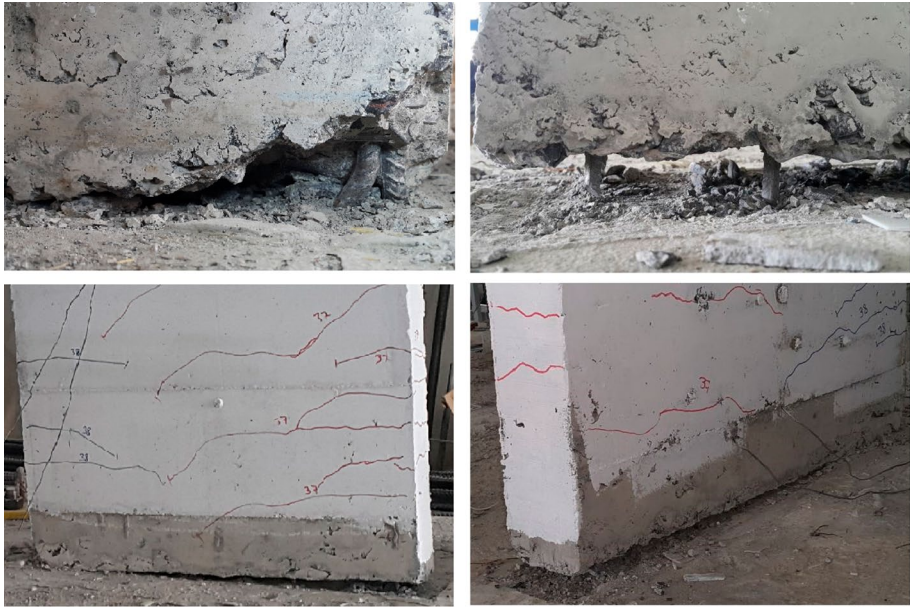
Buckling of the reinforcement of the shear walls and separation at the base of the shear wall in strengthening of the damaged frame test
